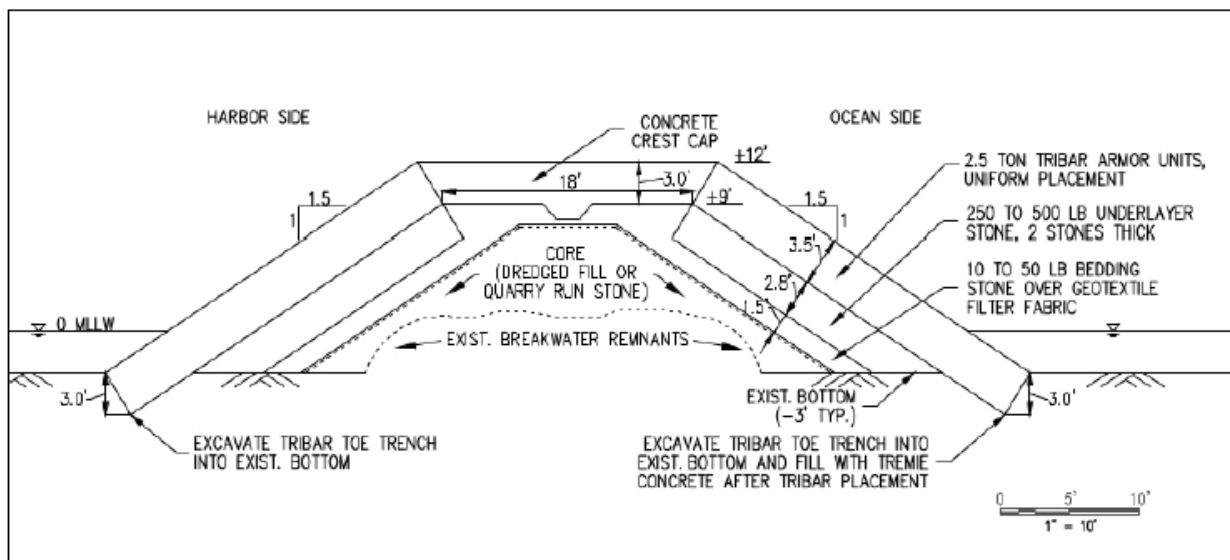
Typical Cross-section of Replace Existing Main Breakwater (Sta 11+00 to 46+00) (Sea Engineering, 2015)
